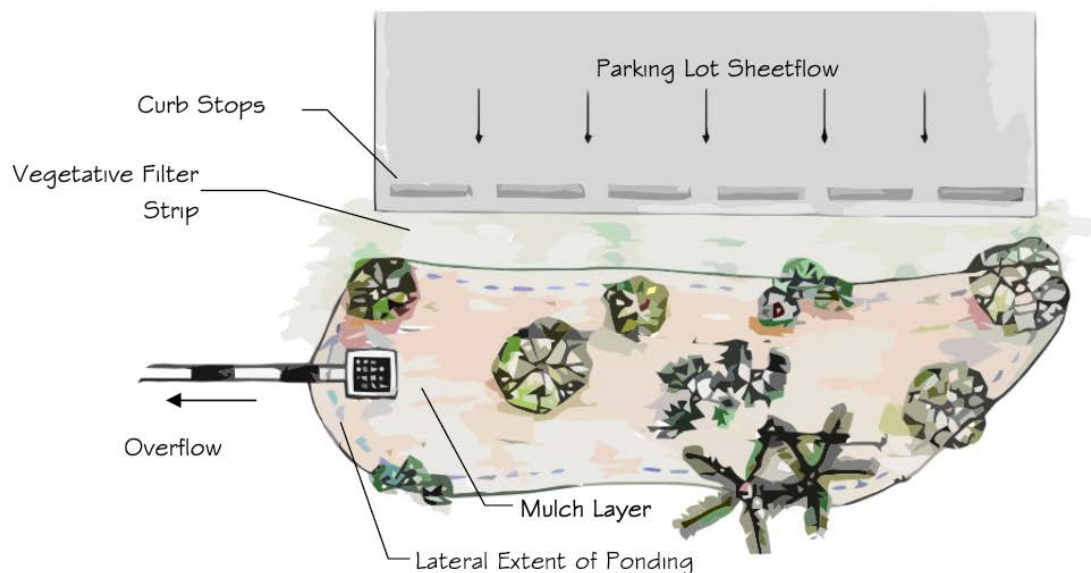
Plan View Illustrating a Shallow Bioretention System
